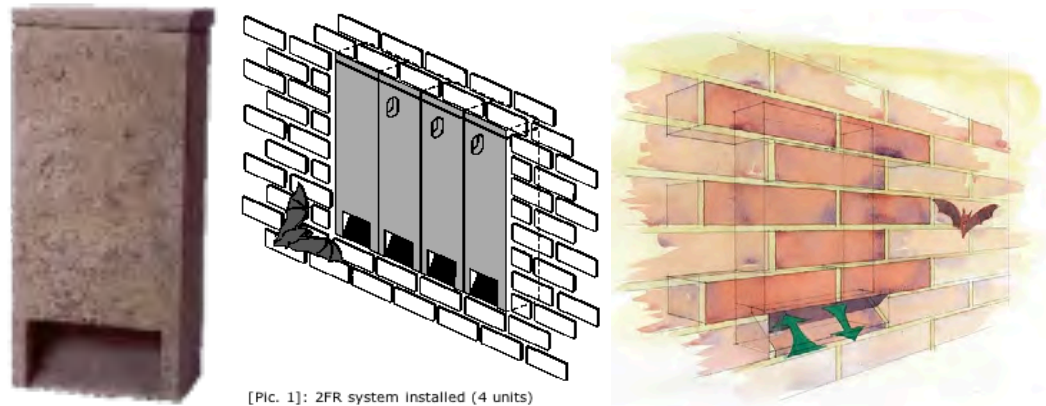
Bat tubes incorporated into the wall of a building to provide roosting space
